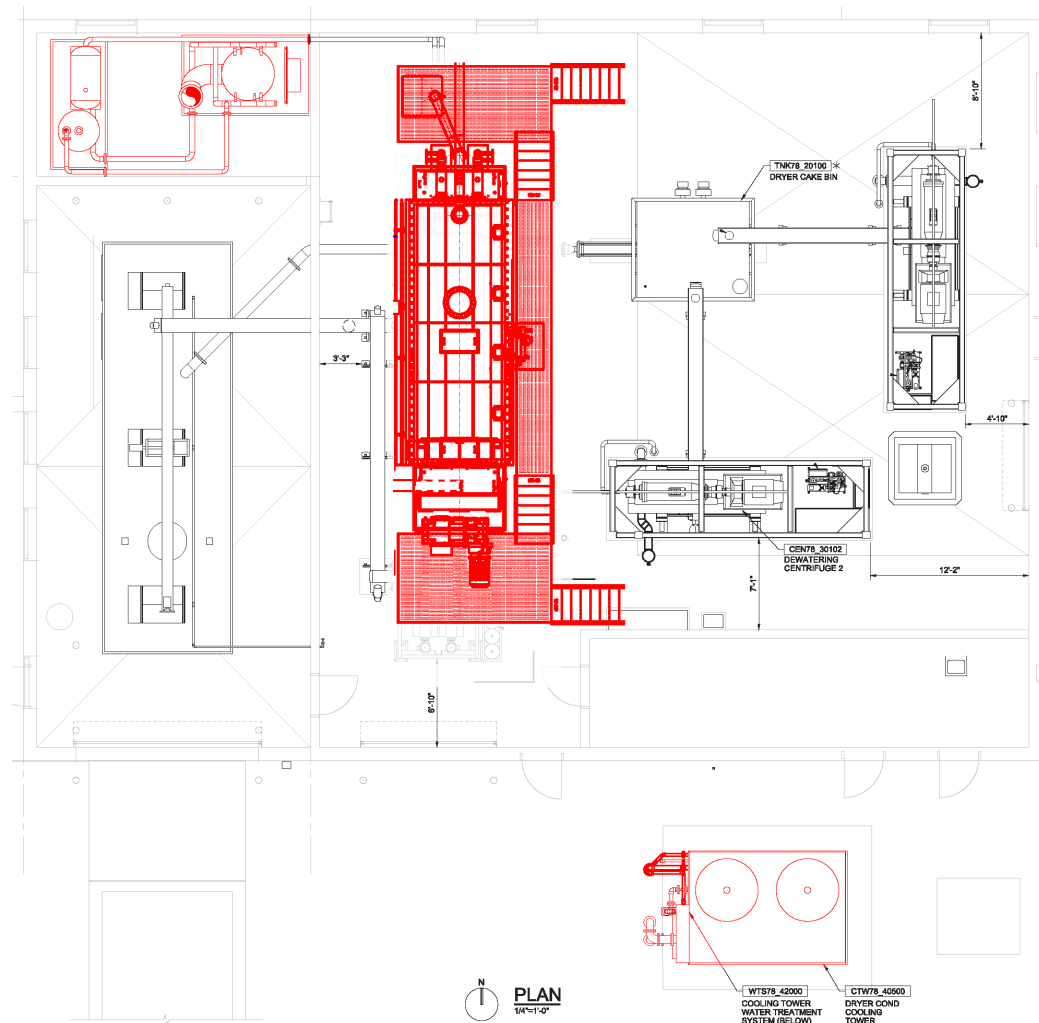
Andritz Solids Paddle Dryer Layout in Existing Dewatering and Dryer Building
